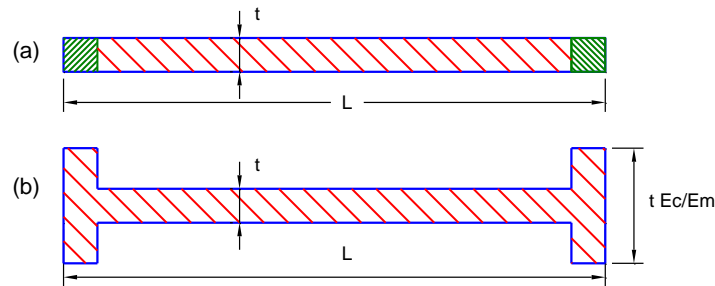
Cross section of the monolithic wall model, (a) rectangular section, and (b) transformed section.
